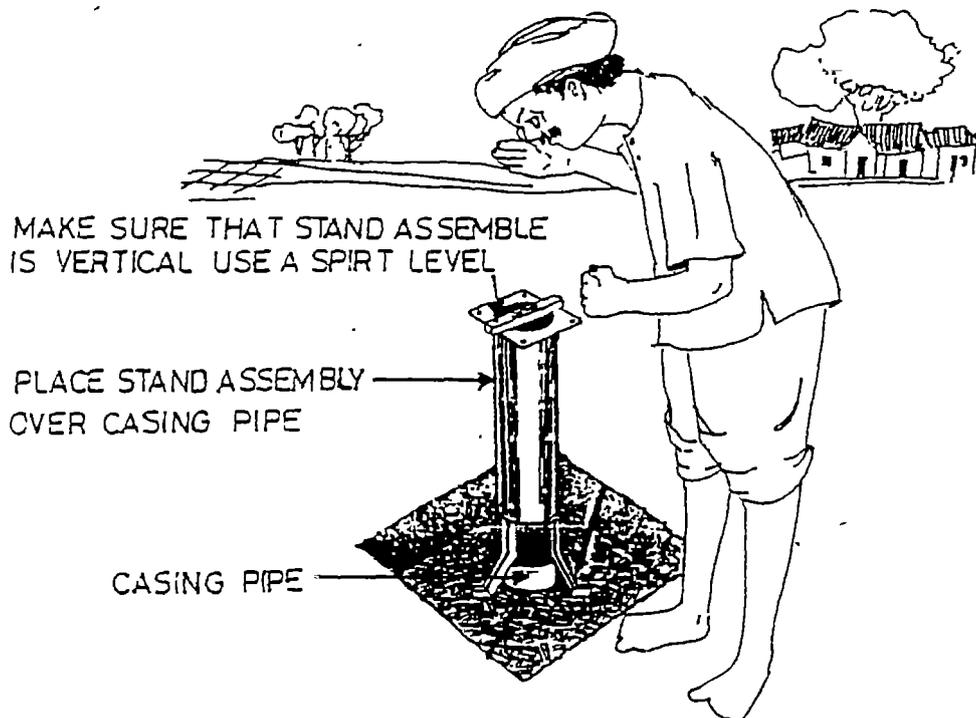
LEVELING STAND ASSEMBLY FLANGE
